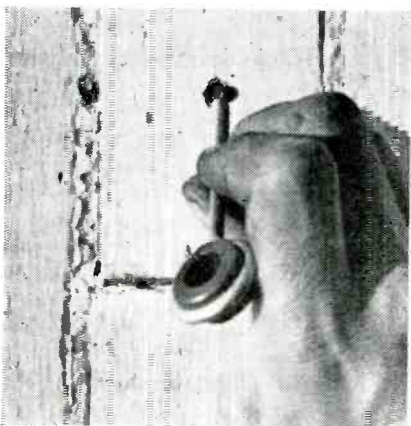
(left.) Fitting insulated screw eye into rawl plug center.
